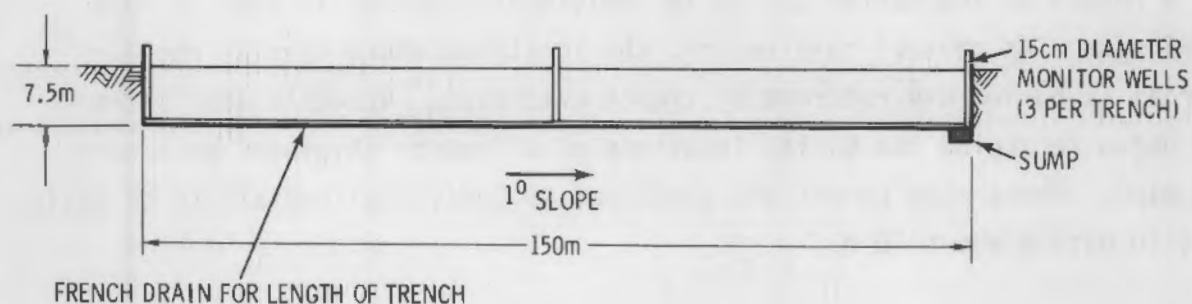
Cutaway View of Typical Trench for Eastern Site
